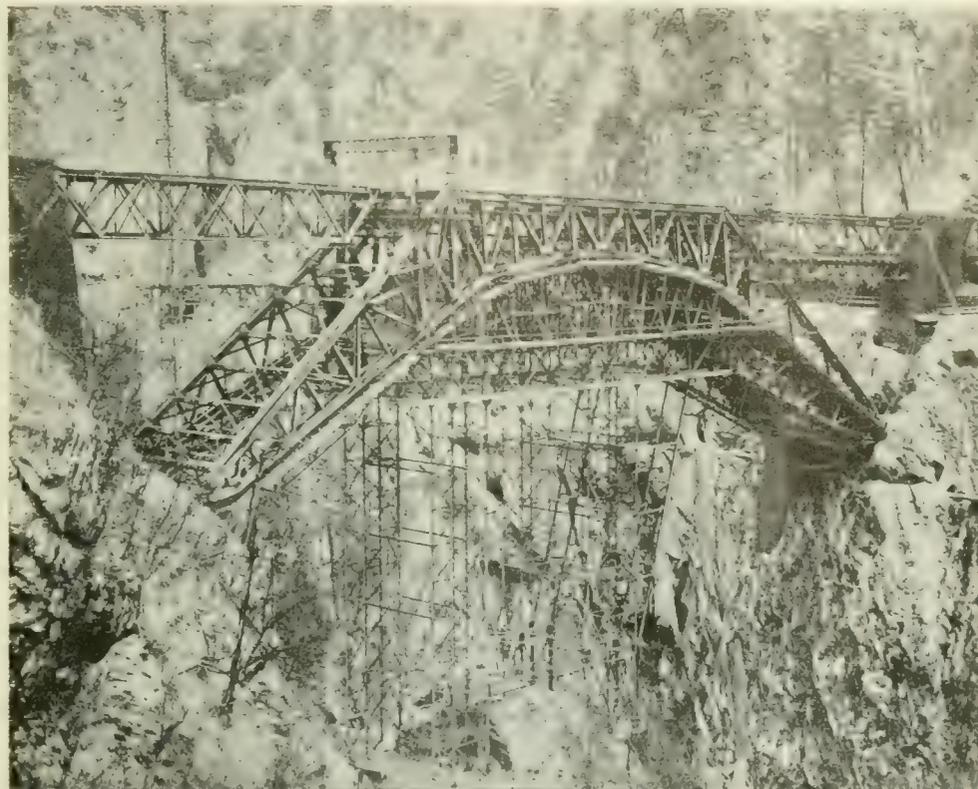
View of Bietschtal Viaduct and Site—Falsework Still in Place—Track Construction and Railing Not Yet Placed.
